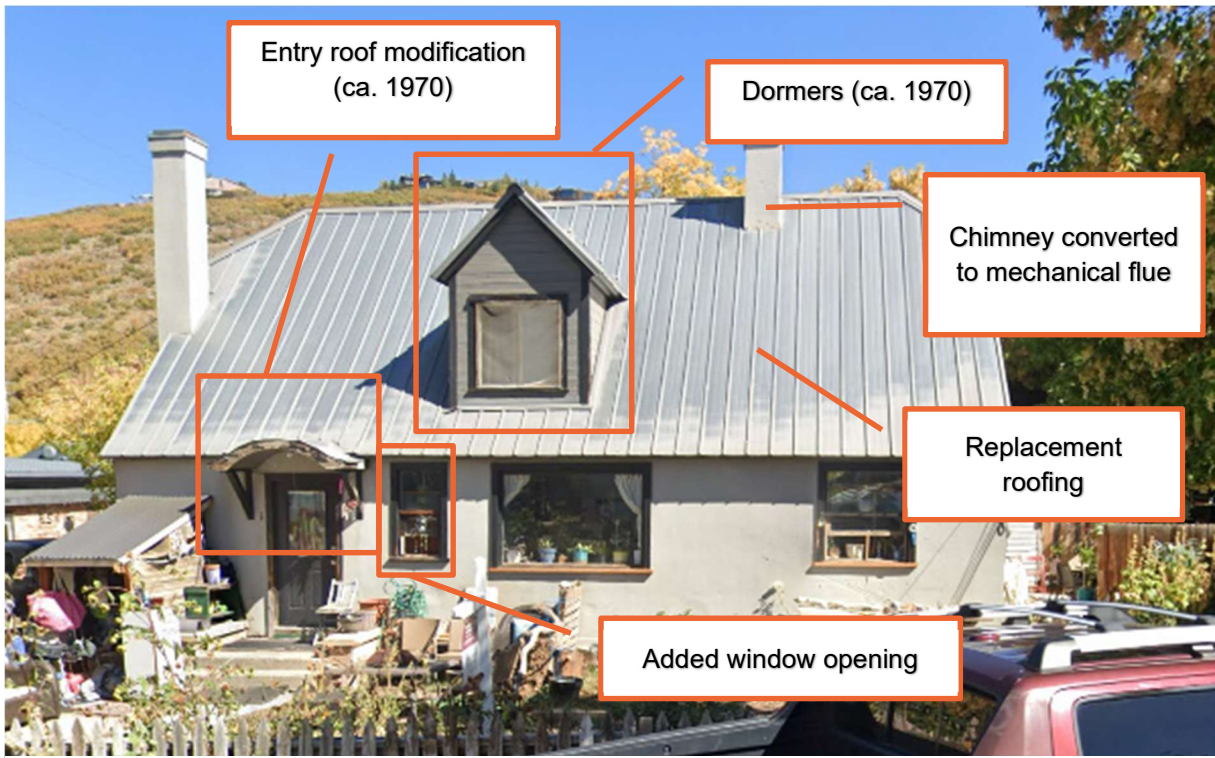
Building modification analysis, primary (west) façade. Source: Google StreetView 2024.
